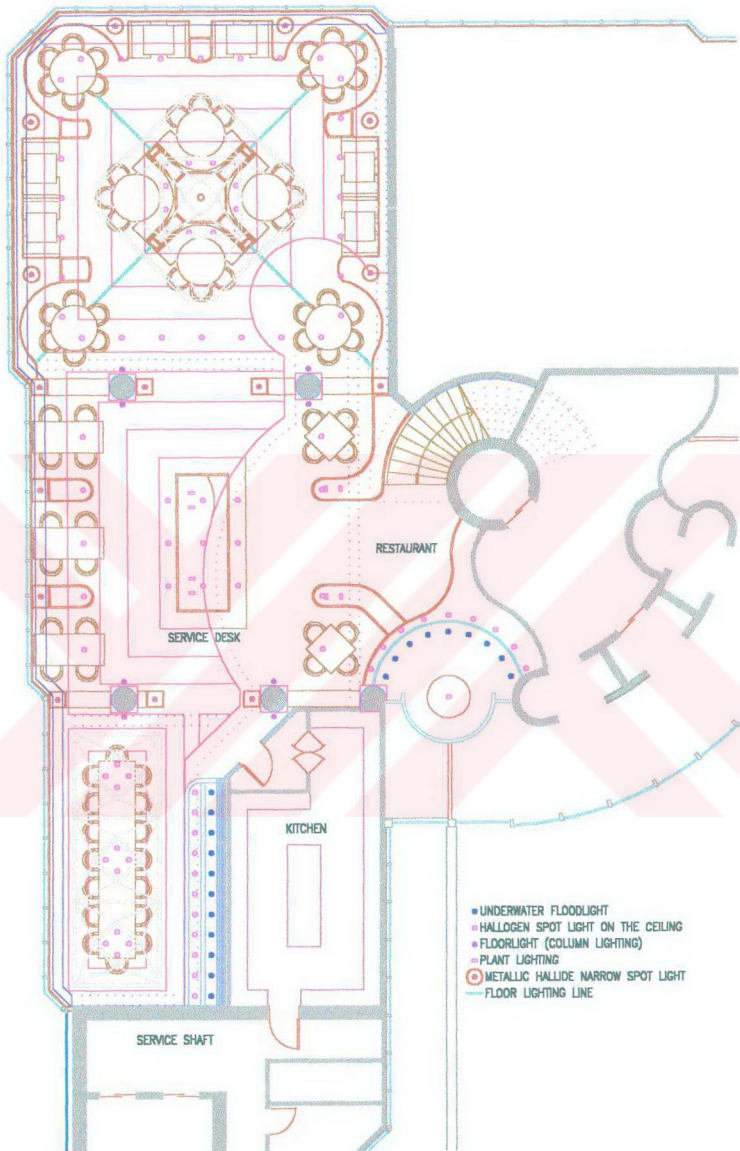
Restaurant plan showing suspended ceiling, ventilation & lighting system.
